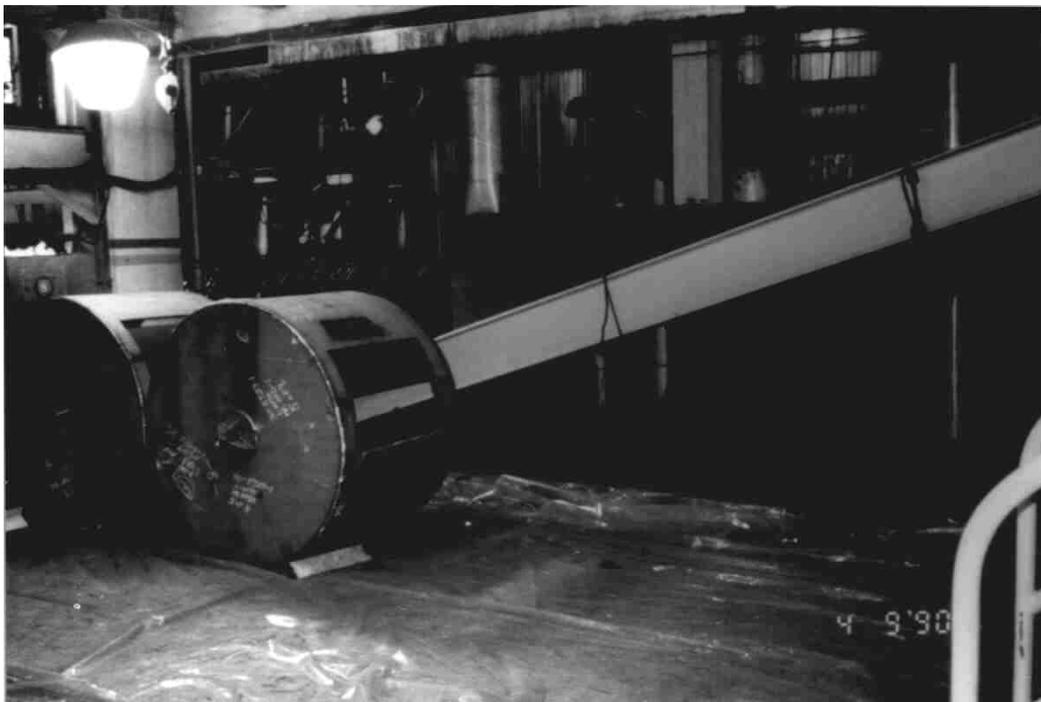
AOFA Port Wall Boxes and Can Dampers Staged for Erection
